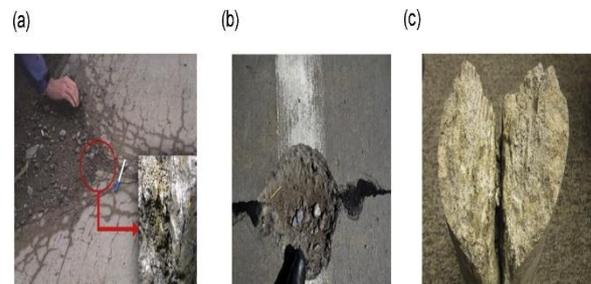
Forms of structural damage to concrete pavements on the plateau. (a) Exposed bone and spalling of concrete pavements. (b) Severe damage at structural joints in concrete pavements. (c) Freeze-thaw damage at structural joints in concrete pavements (Wang et al., 2018d).
